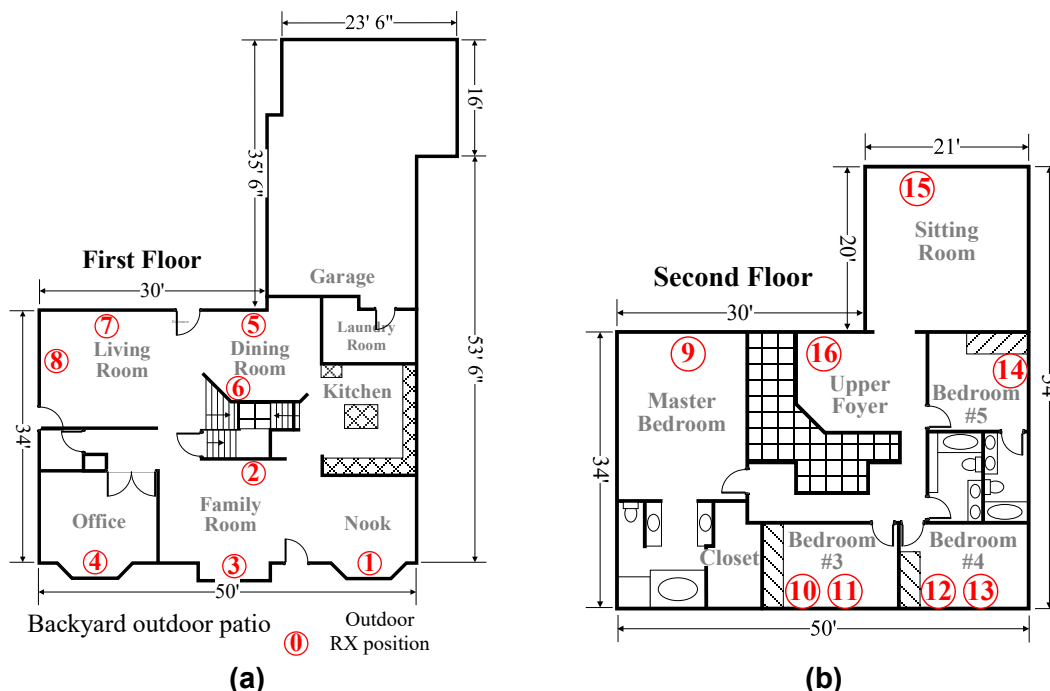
Floor plan of the house, showing 16 indoor and one outdoor RX test positions (a) first floor; and (b) second floor [13]
